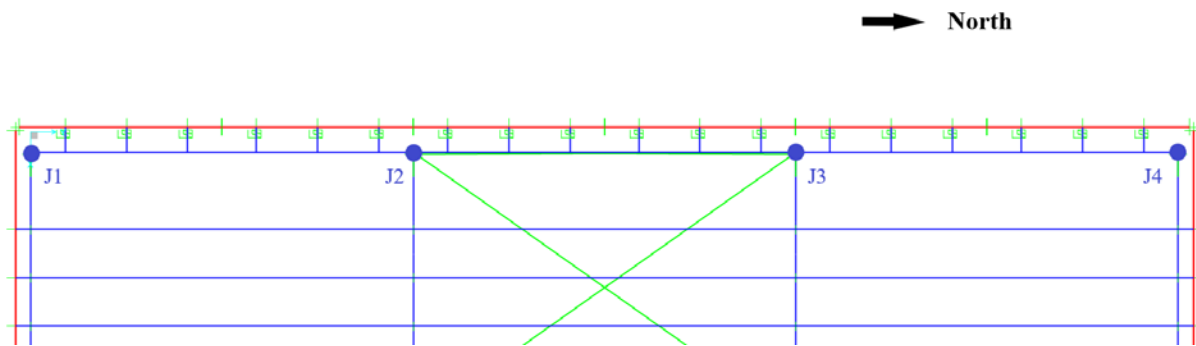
Joint along the West Wall Spandrel Beam for 16P3_RFC1000_SL14.5 (Plan View)
